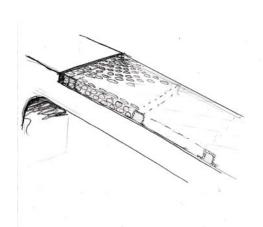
Bench without backrest. Detail. (Author, 2008)
